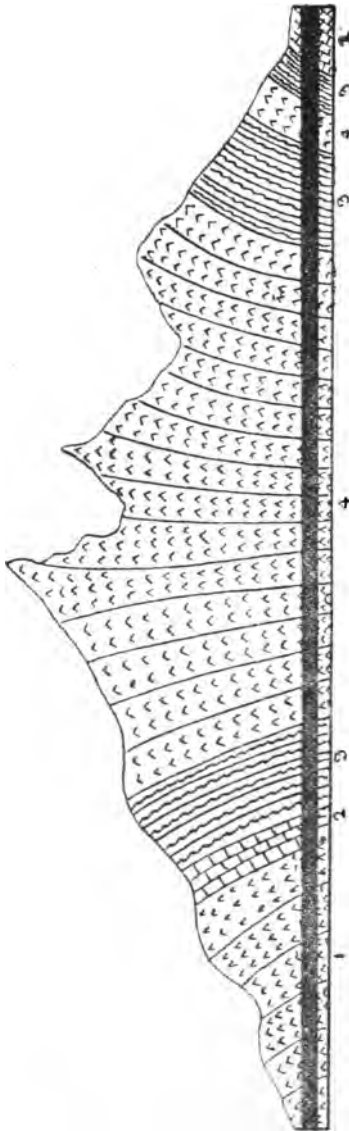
ST. GOTHARD TUNNEL, SHOWING FAN-SHAPED STRUCTURE.
